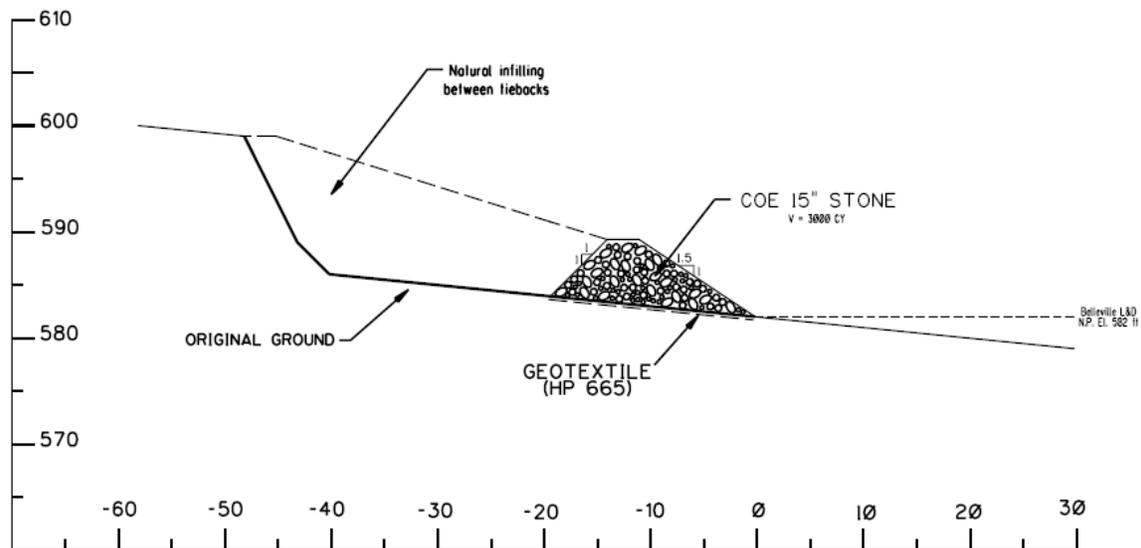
Typical cross section of longitudinal dike protection of failed bank. Area behind dike will fill in naturally. Scale is in feet.
